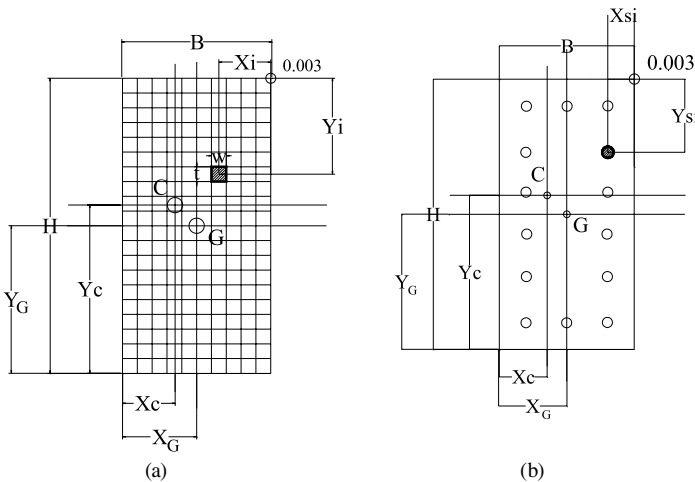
Geometric properties of concrete filaments and steel rebars.
